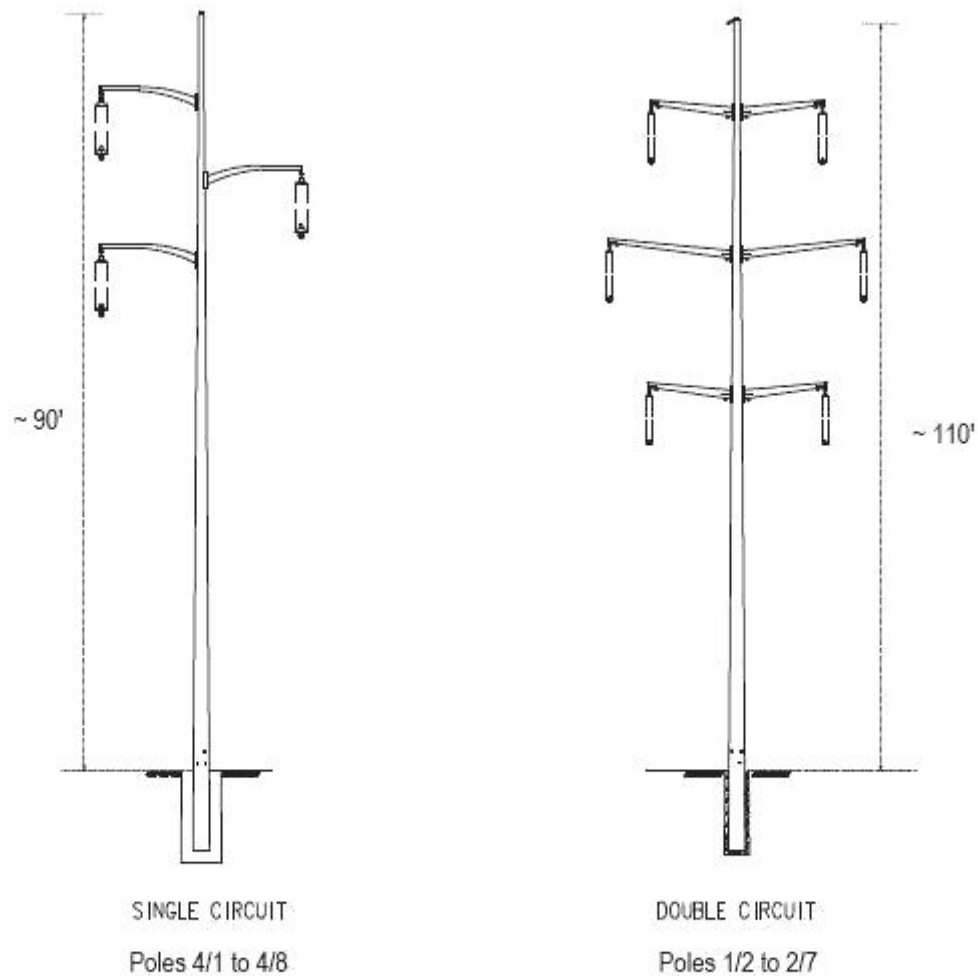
Steel 230kV structures to be used for short segments of the Palisades-Goshen Transmission Line.
